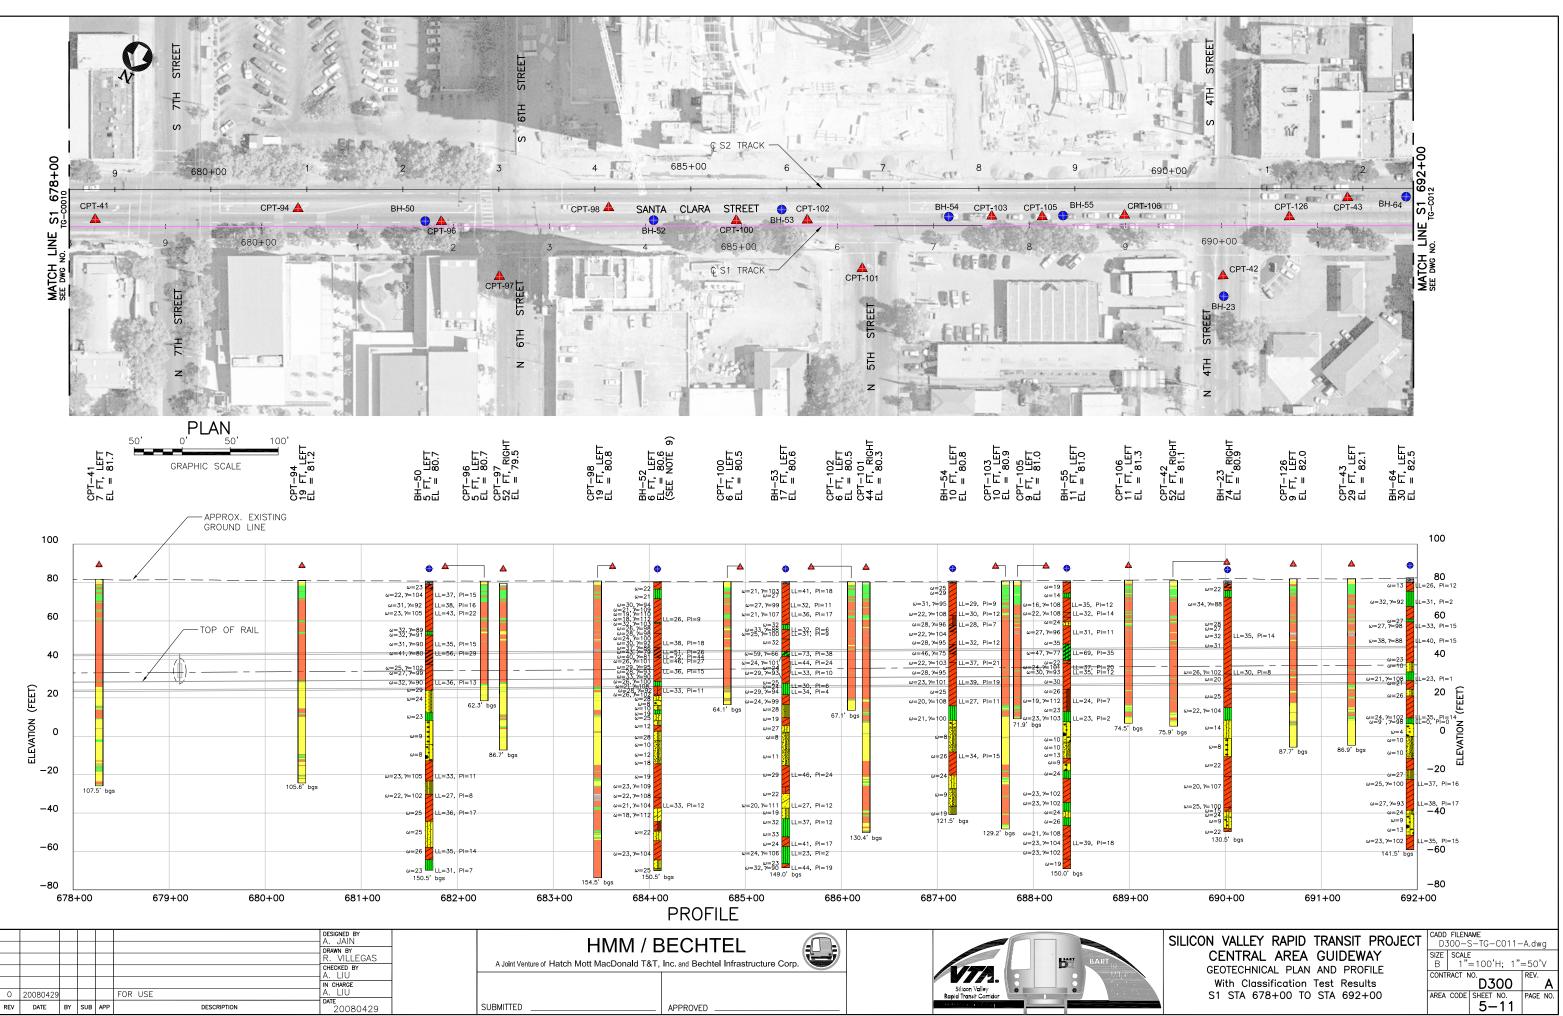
Geotechnical Plan and Profile with Classification Test Results: STA 678+00 to STA 692+00
